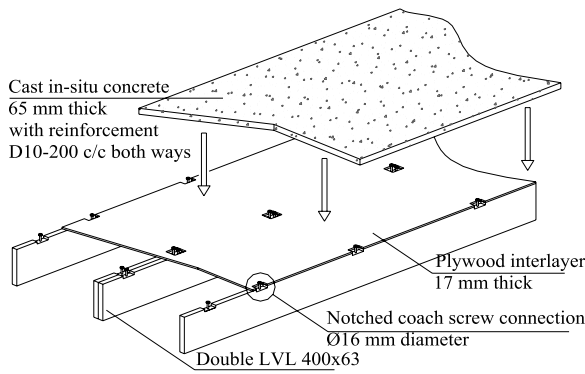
Proposed semi-prefabricated LVL-concrete composite system (dimensions in mm).
